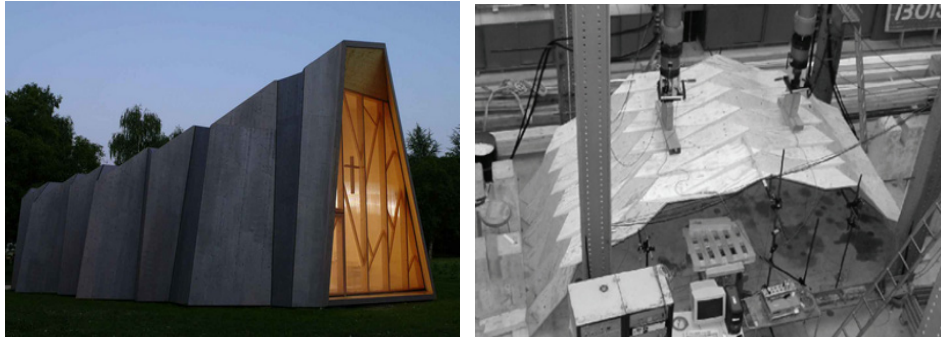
Building scale examples – hospital chapel in Waatland and IBOIS laboratory experiment [1]
